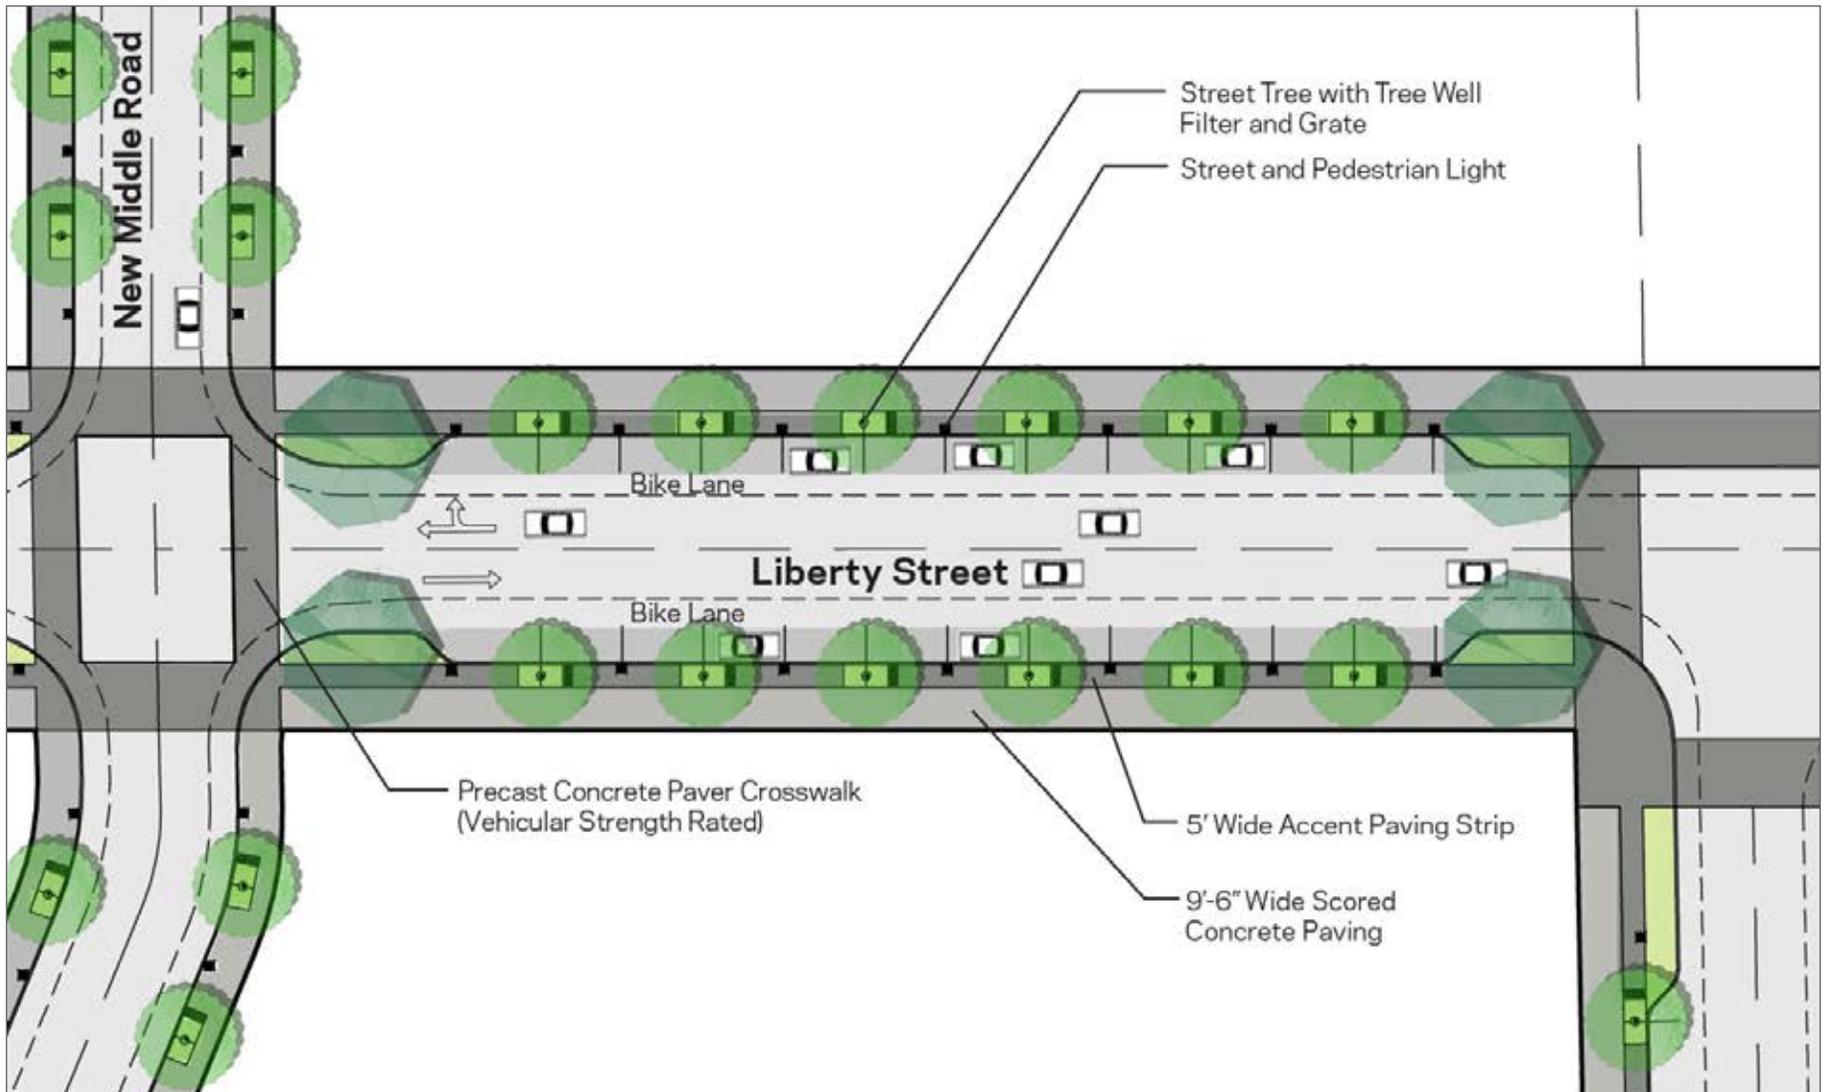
Liberty Street: Capitol Ave. to Beacon Ave. - Street Plan (top)
